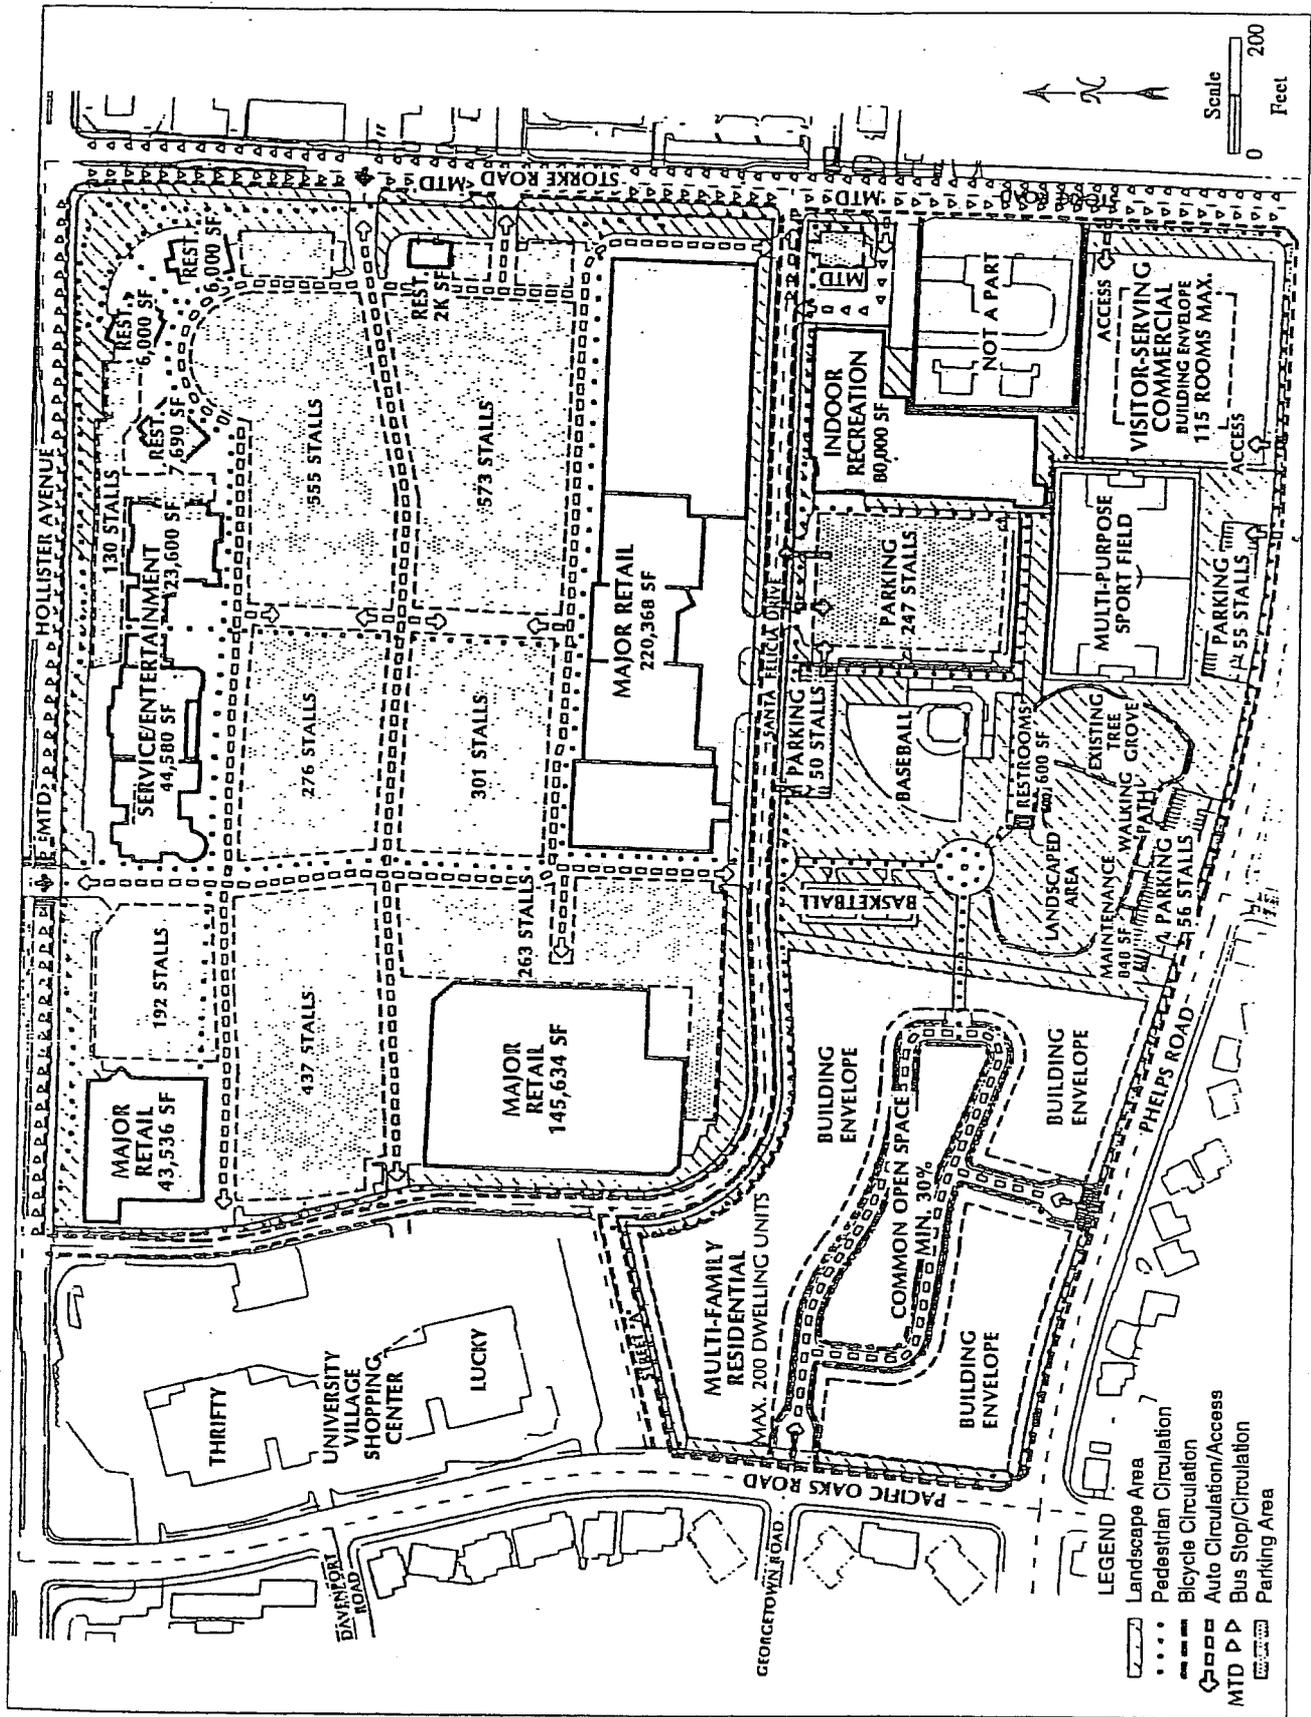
Camino Real Specific Plan (95-SP-001)
